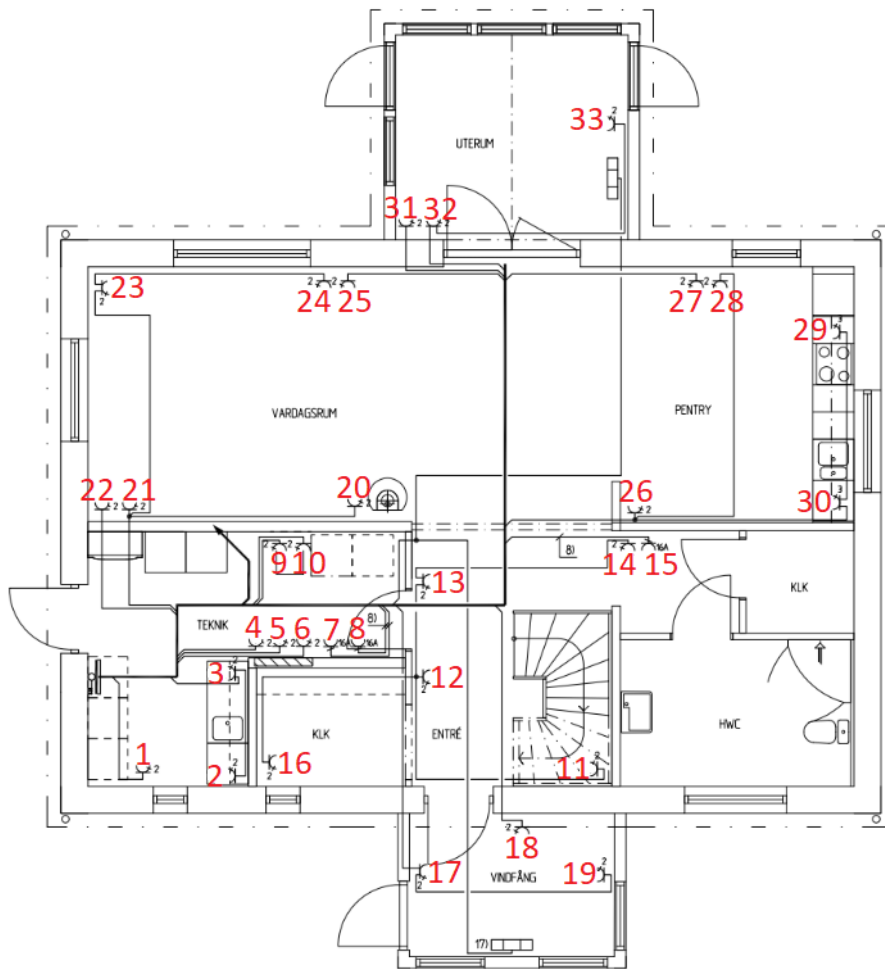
Layout of stationary and outlet connected appliances for the second floor.
